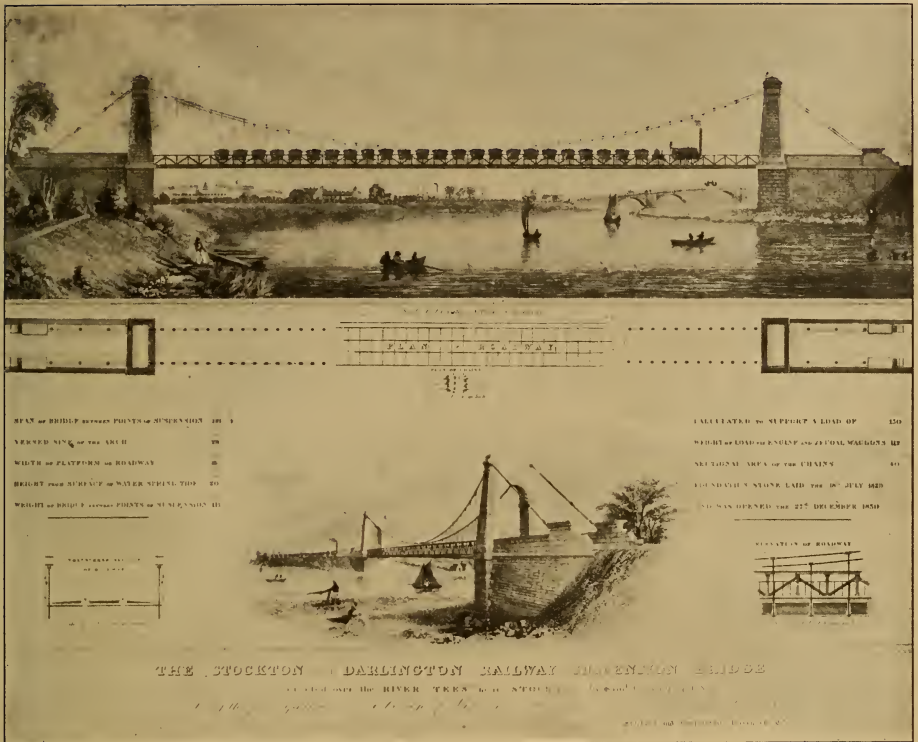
STOCKTON &amp; DARLINGTON SUSPENSION BRIDGE
